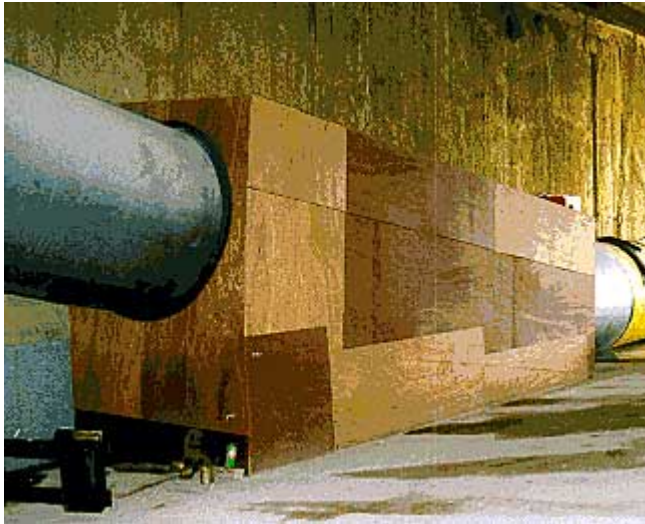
Ventilation fan equipped with site-made silencer encased in plywood
